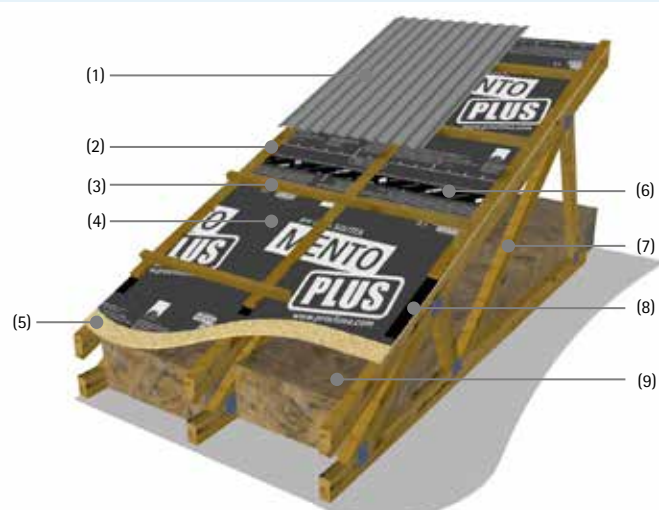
Technically, "sheathing" refers to rigid boards placed onto the rafters or top chord of a truss to support the membrane under the cladding while providing structural support to the roof. (1) Roof sheeting (medium colour), (2) Counter batten, (3) Fixing batten, (4) SOLITEX MENTO®, (5) Sheathing (bracing), (6) TESCON EXTORA® (Weathertight sealing tape), (7) Roof truss, (8) TESCON® NAIDECK (Double sided self-sealing strip), (9) Fibrous insulation
